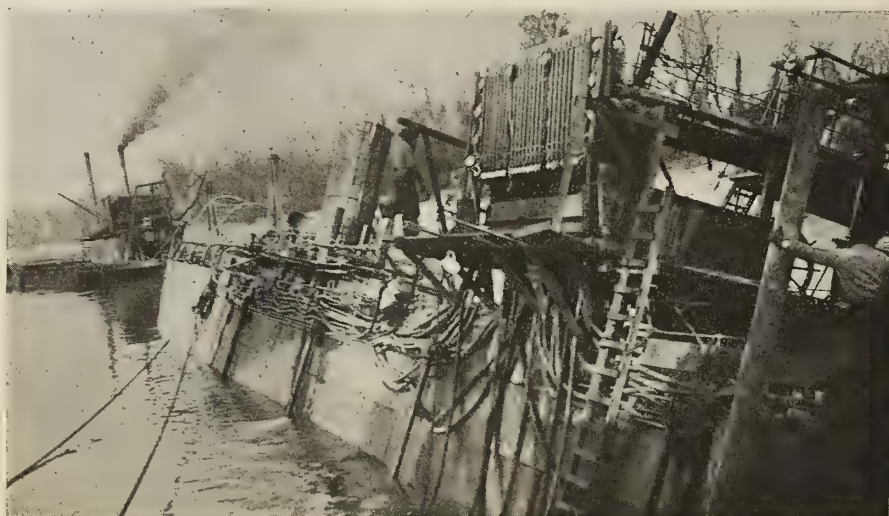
Photograph Showing Pivoted Gage Platform and Compressed Air Connections Centering There
